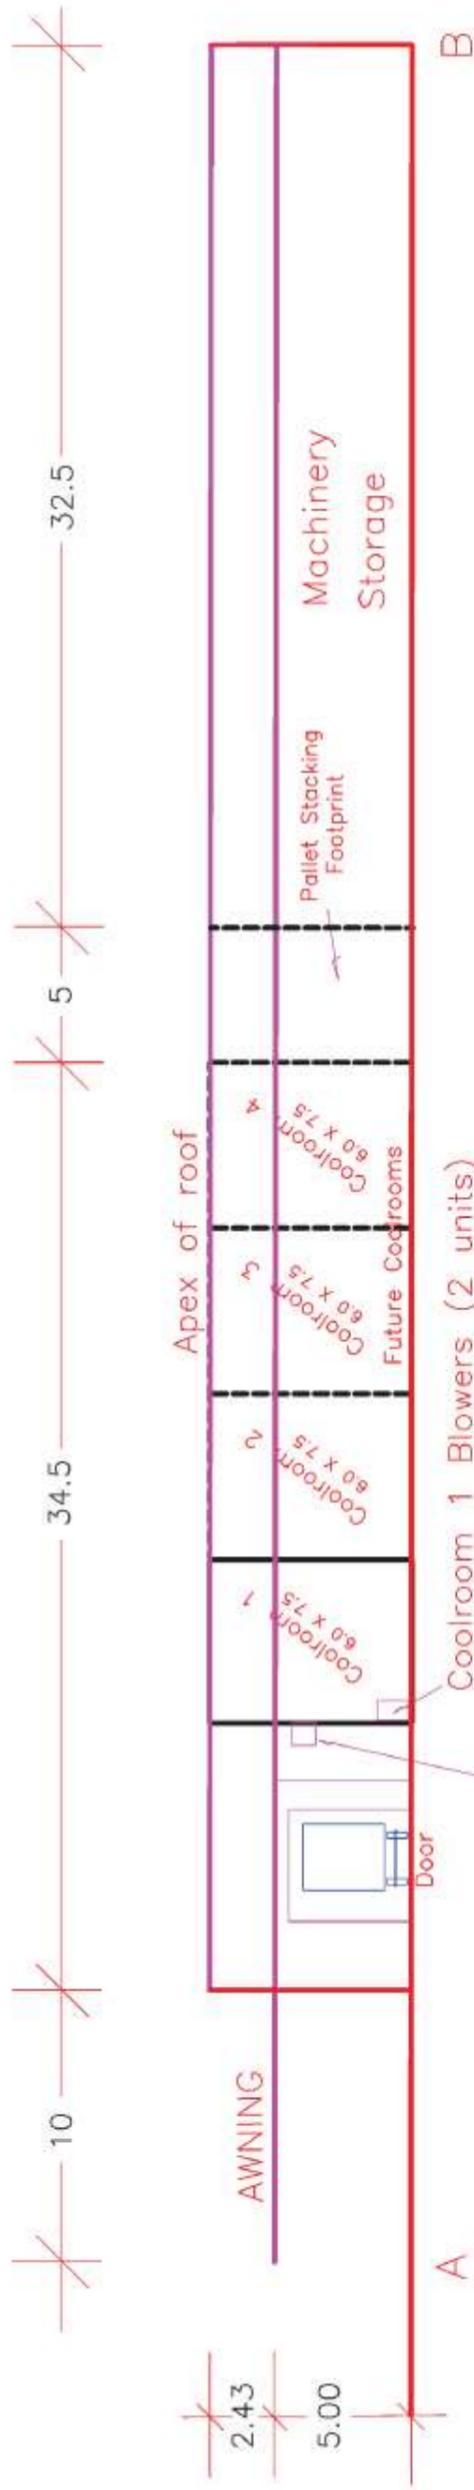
DETAIL PLAN FOR PROPOSED MARKET GARDEN SHED AT No. 25 AND
